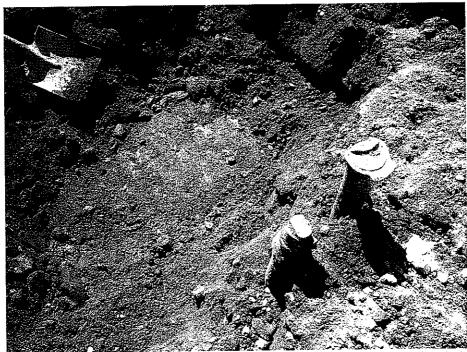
Fifth Street Test Pit revealed a concrete pad at approximately 4 feet below the surface grade. The "fuel oil" fill port was encased in the concrete.
